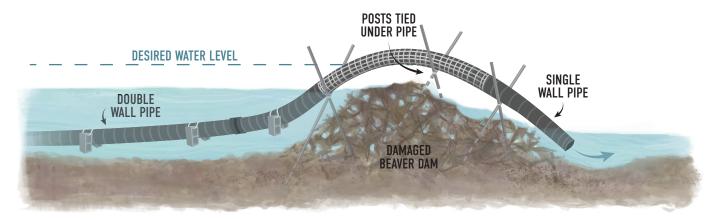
Installing or adjusting pond leveler to account for dam damage.
